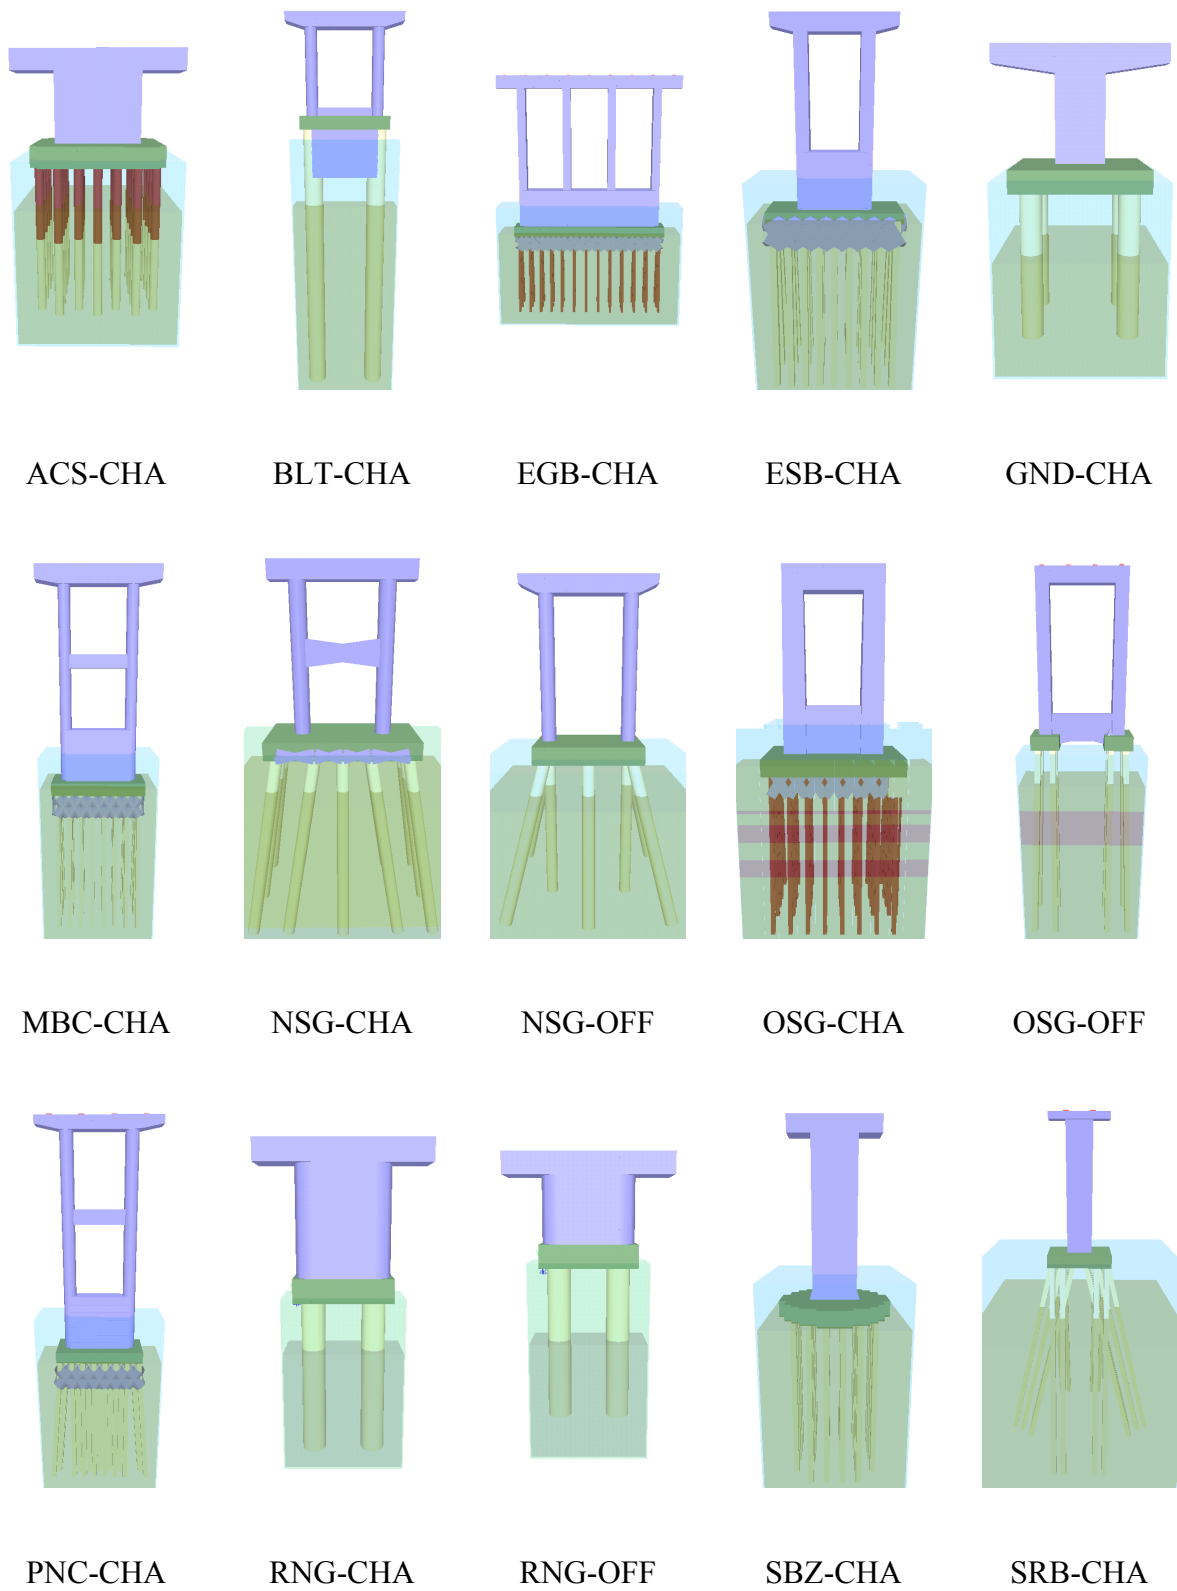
Bridge pier structural configurations (superstructure not shown).
